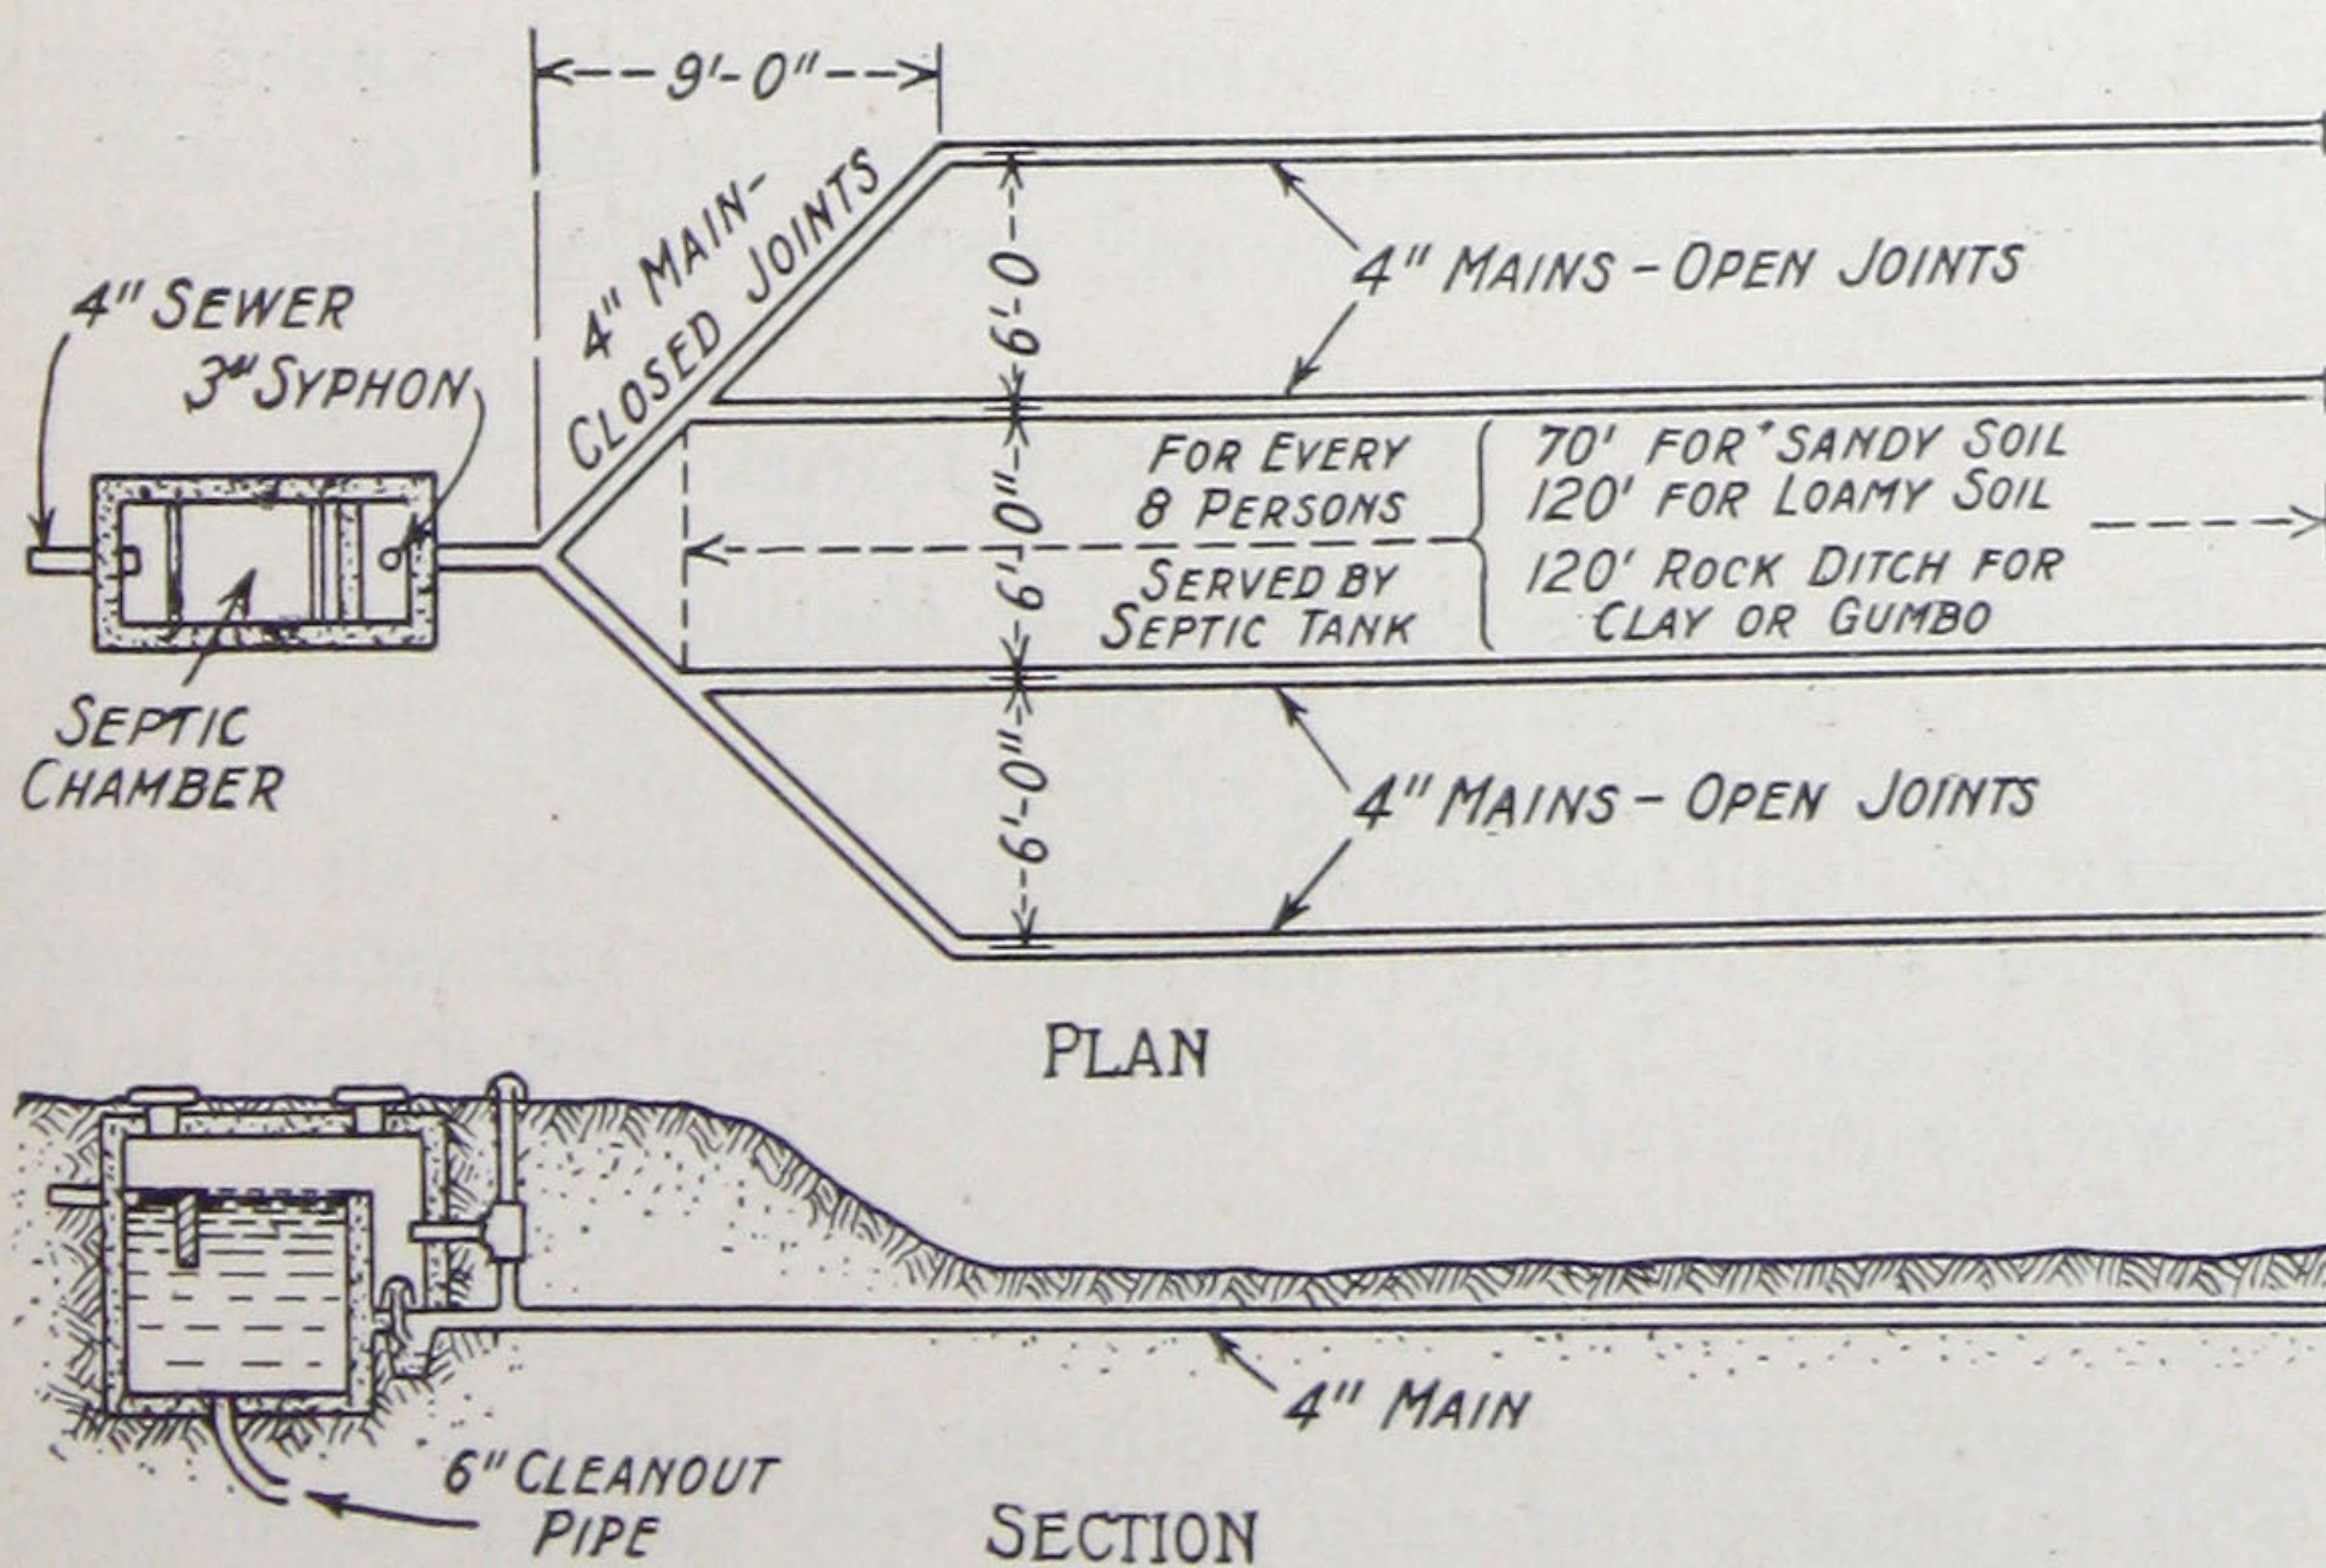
Plan of typical septic tank system showing the connections to plumbing.
